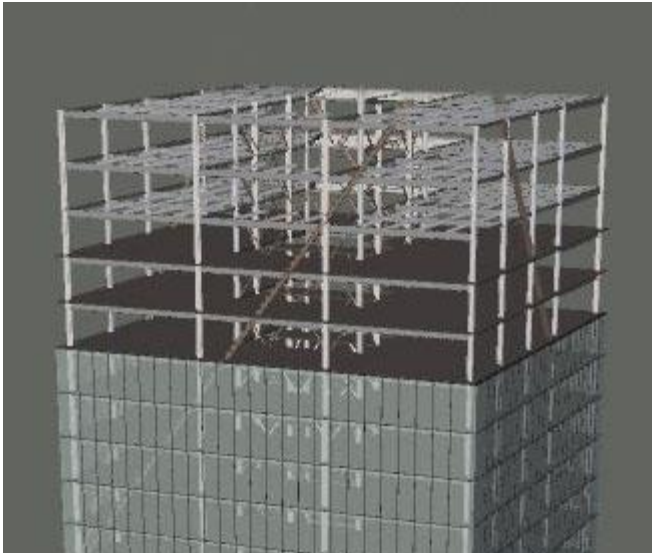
Lateral beam construction. Note the installation of the lateral beams is dependent on the placement of the floors each supports.
